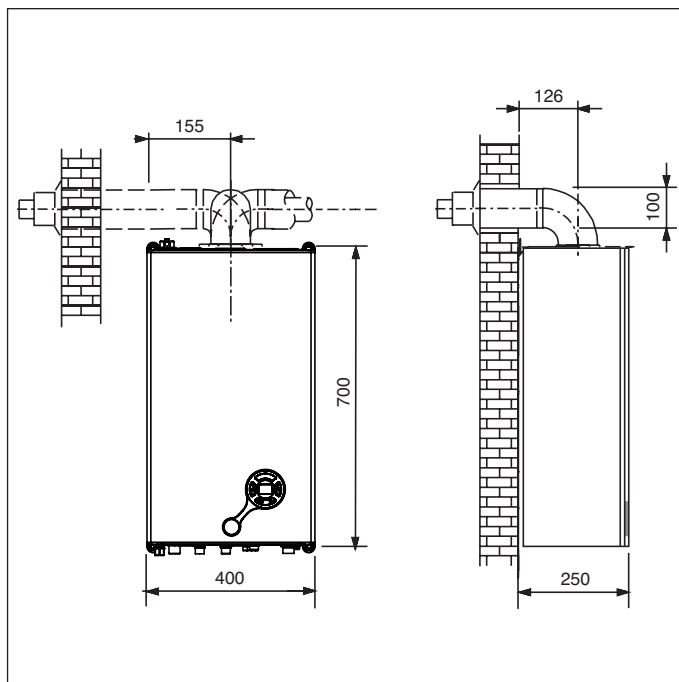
Type C12 - C33 coaxial pipes dimensione
